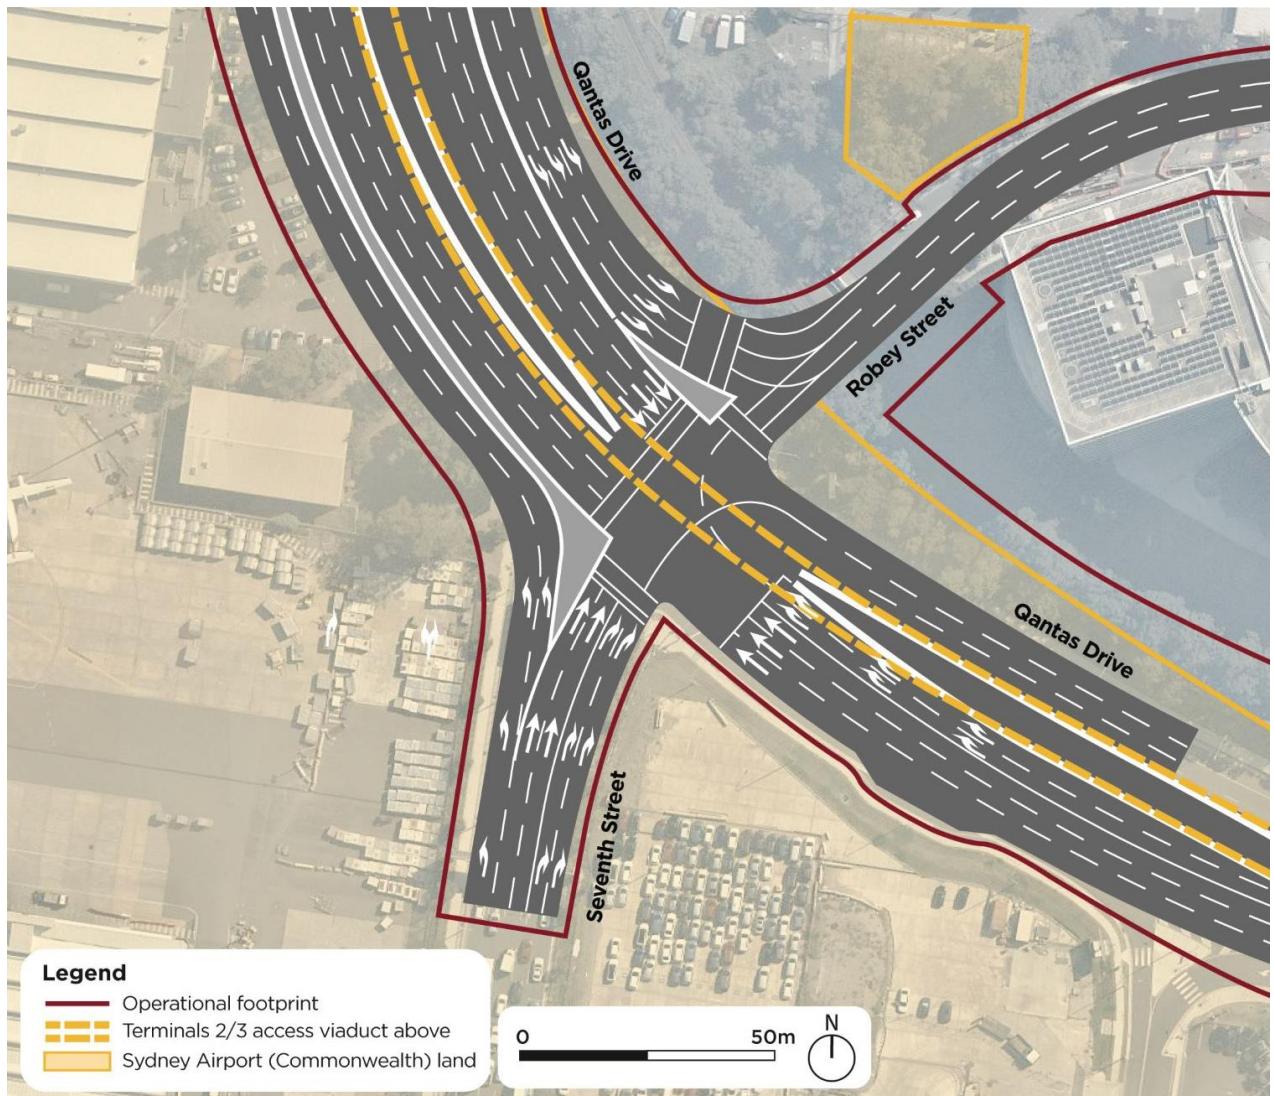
Qantas Drive/Robey Street/Seventh Street intersection upgrade and lane configuration
